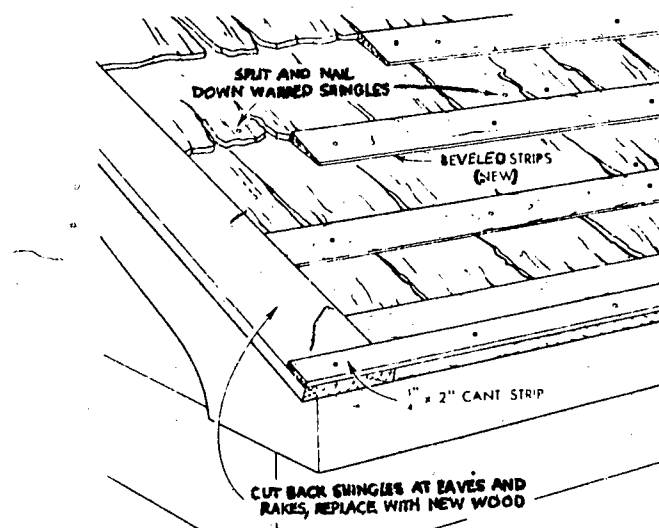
Preparation of old roof for reroofing with mineral fiber shingles.
